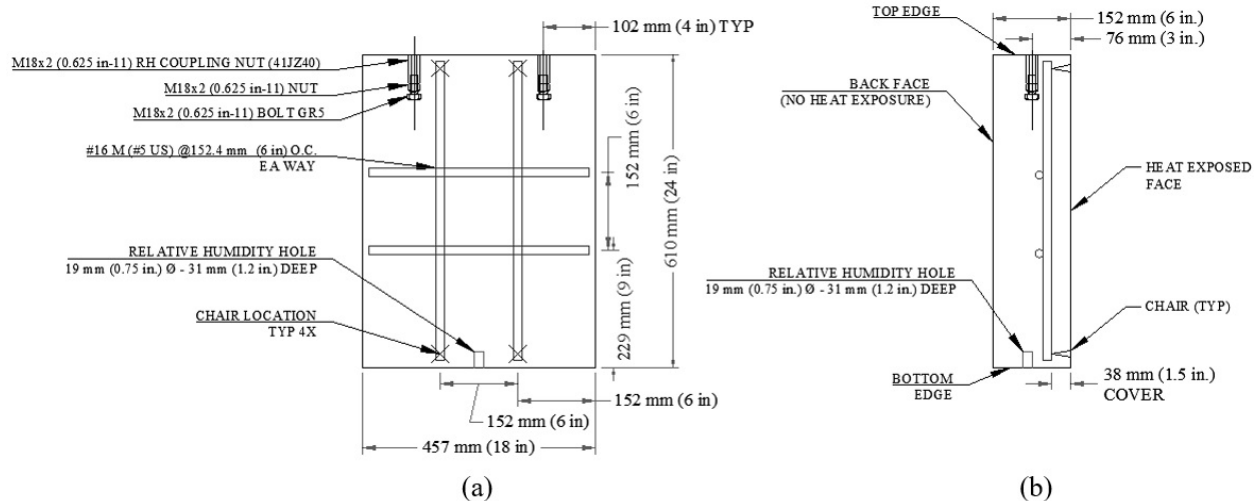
Concrete specimen details: (a) front view and (b) side view
